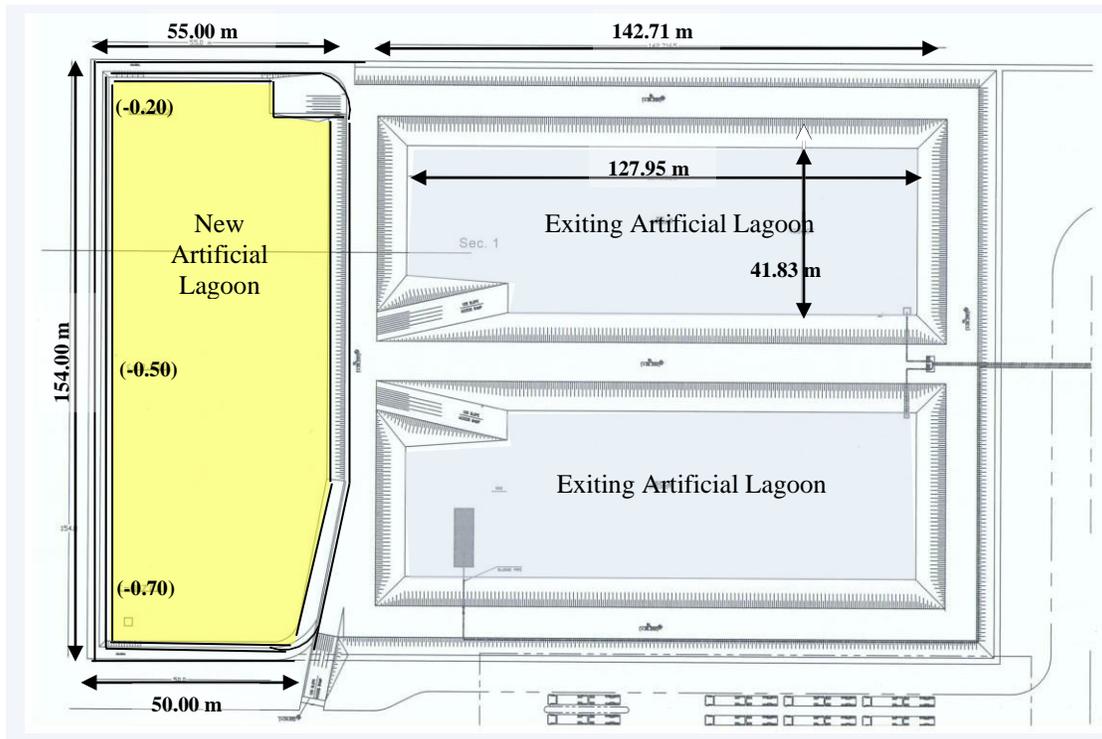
Plan of the position of the new required artificial lagoon close to the existing lagoons
